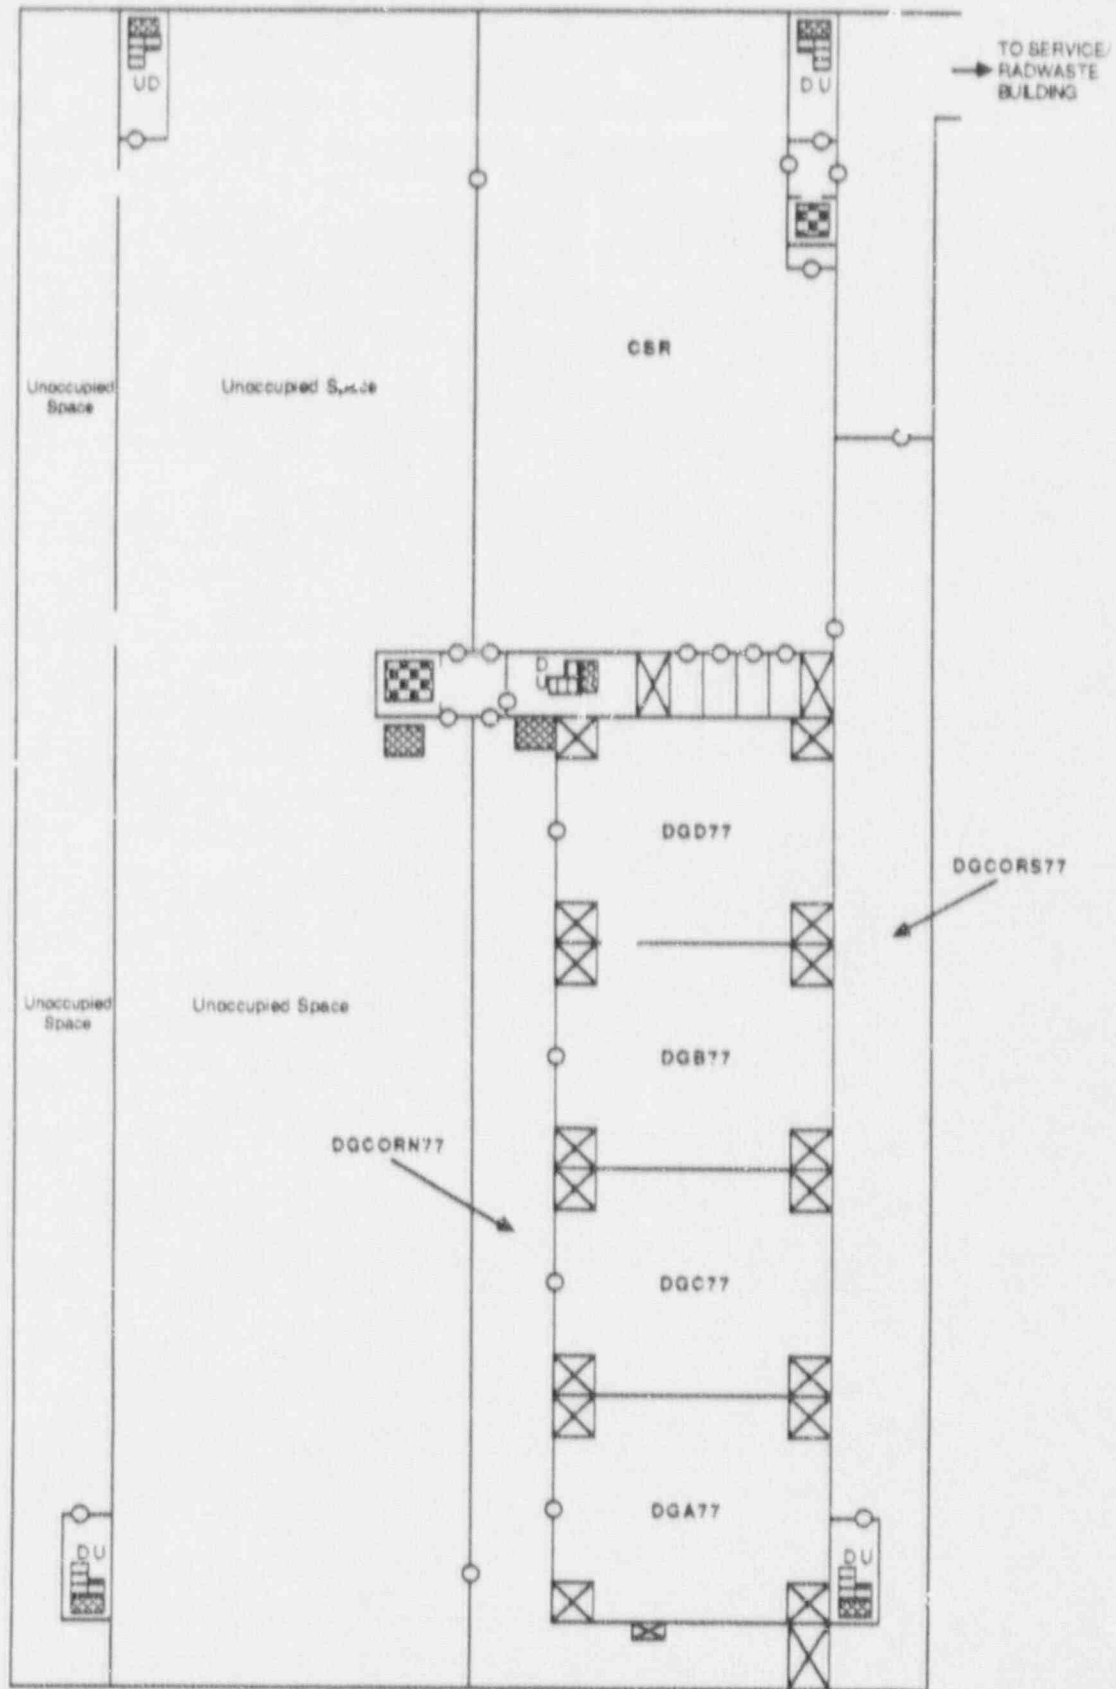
Hope Creek Control/Diesel Building Elevation 77'-0"
